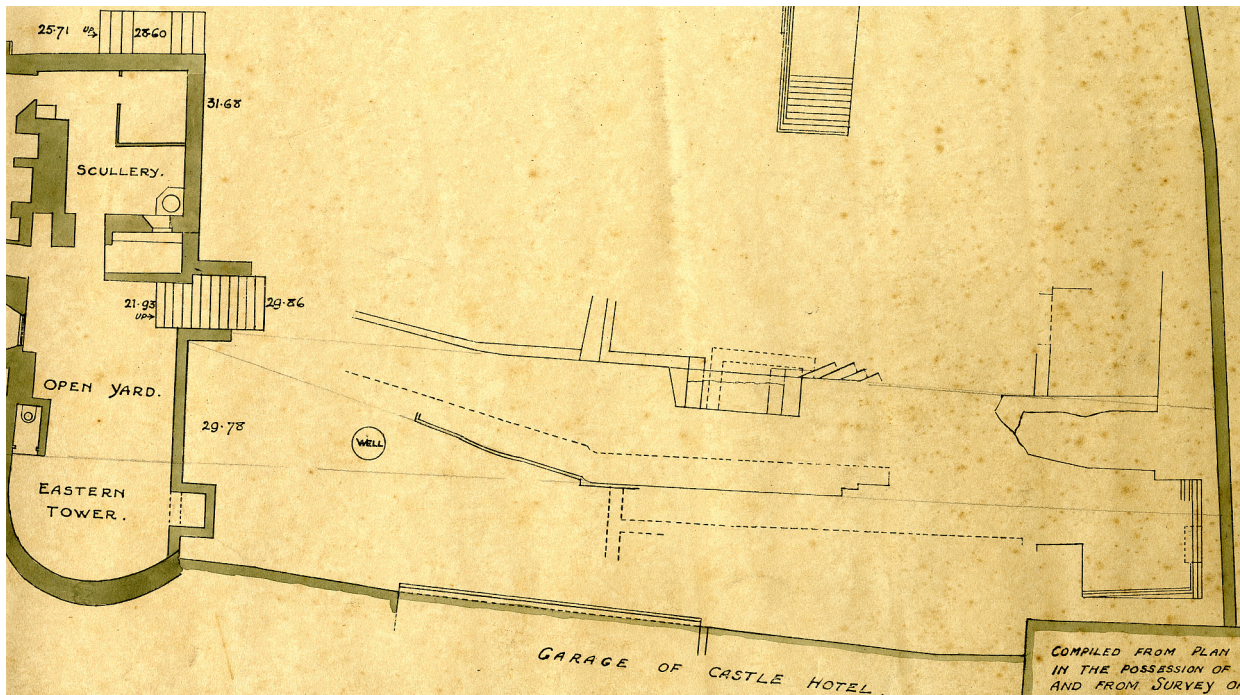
Extract from AB Botterill's plan of 1928-30 showing the area of Wall B and Room E. Detail from SANHS Maps C10-1.
